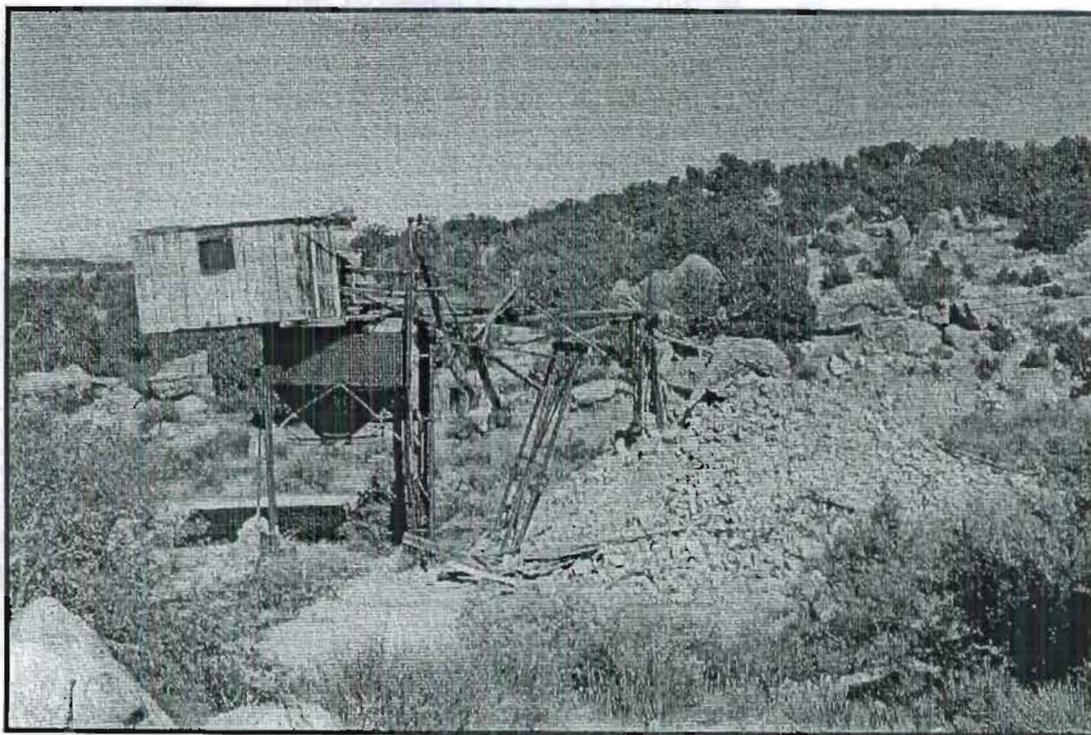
The Radium Hill No.10 Mine on Wedding Bell Mountain featured a typical hoisting arrangement. The hoist was mounted on a plank floor built over a prefabricated ore bin. Workers constructed a flimsy, frame hoist house around the floor. A rail line extended right over a trestle, down the inclined ramp, and into the shaft. Guy cables keep the overhanging structure from toppling over. Source: Author.
